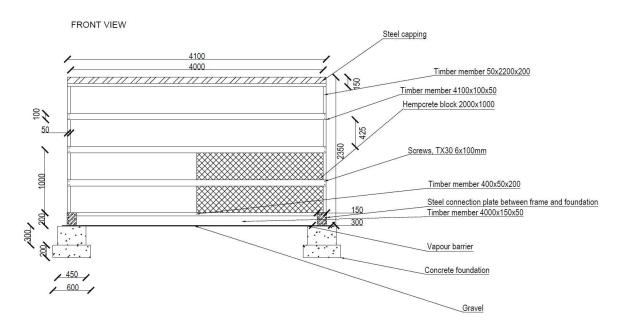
2D drawing of Hempcrete noise barrier wall. Front view.
